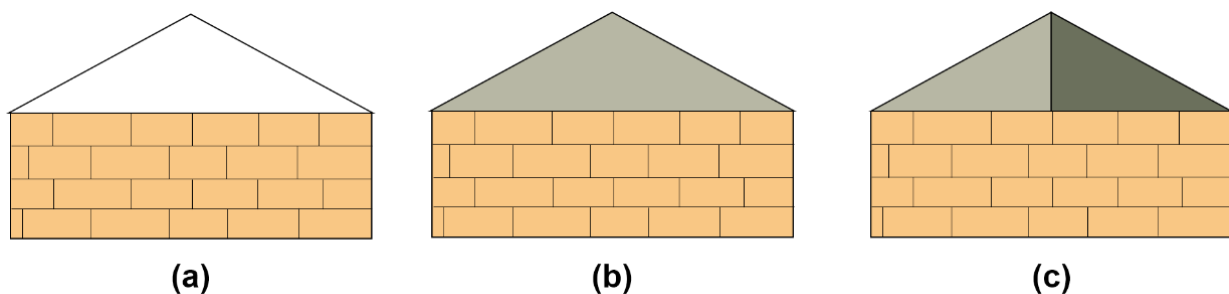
Various roof designs of rural Kyrgyz houses: (a) open gable roof, (b) closed gable roof, (c) hip roof.
